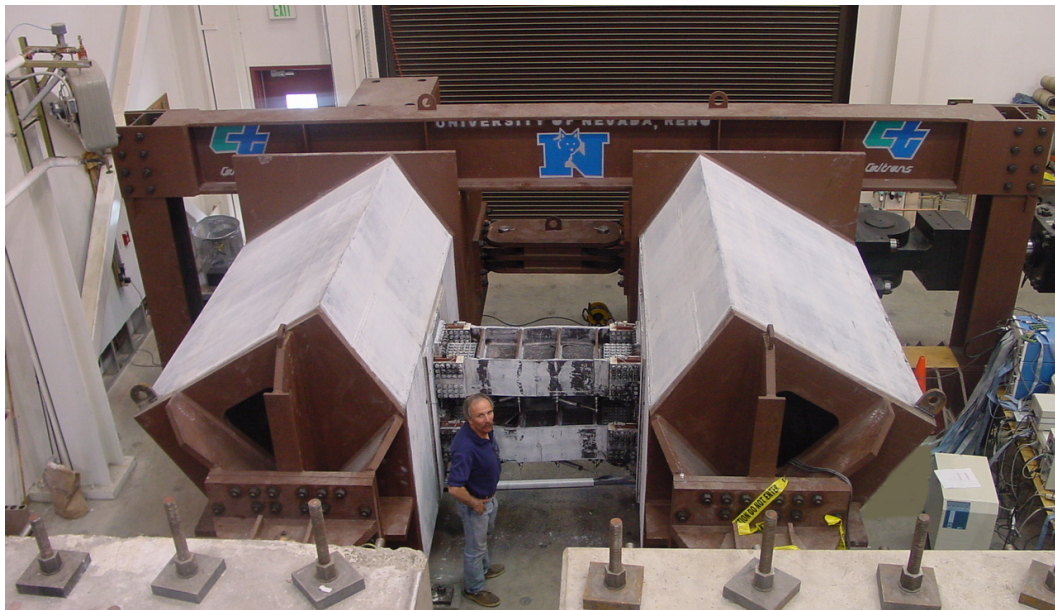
Test assembly in Large-Scale Structures Laboratory at University of Nevada Reno (Type 1 link shown).
